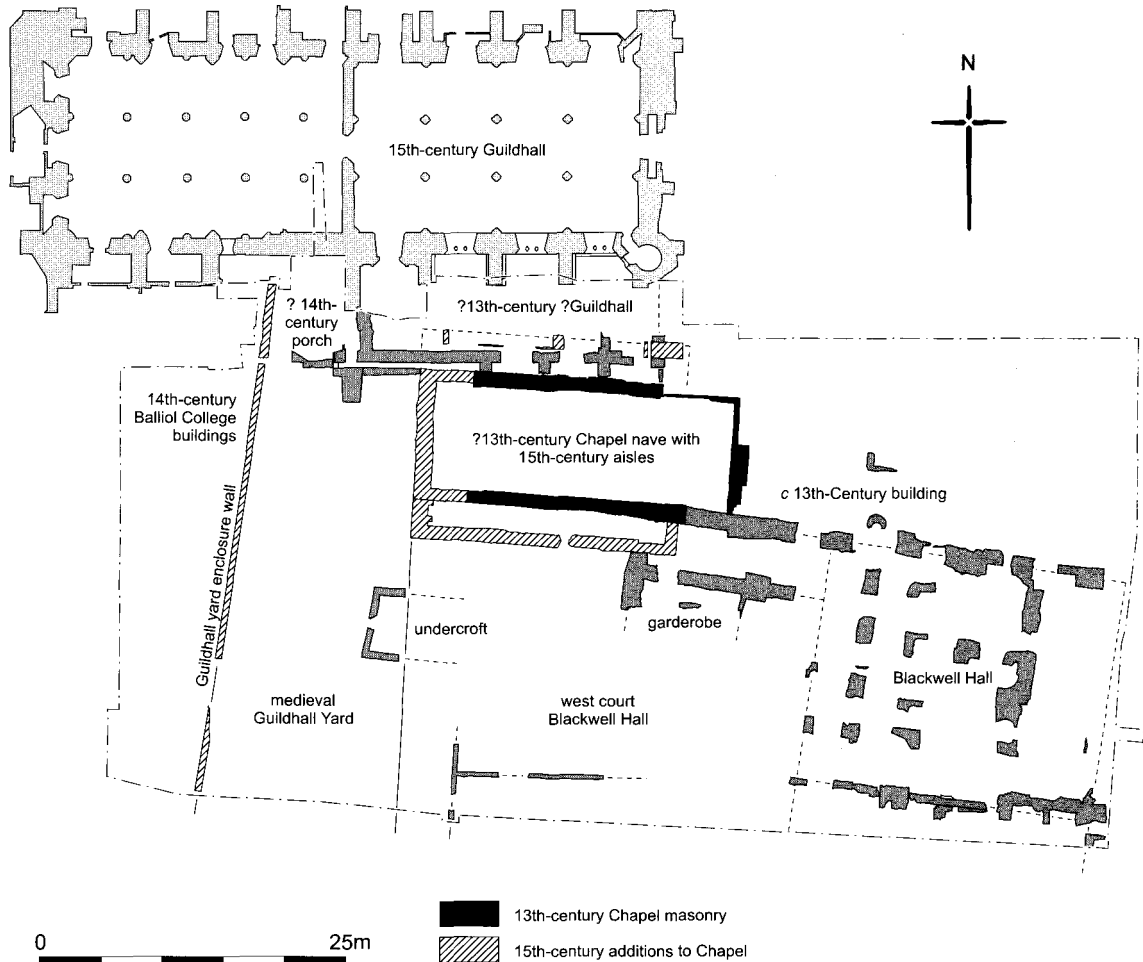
Plan of 13th-century Guildhall Chapel, showing the extent of the 15th-century aisles and adjoining buildings (MoLAS)
